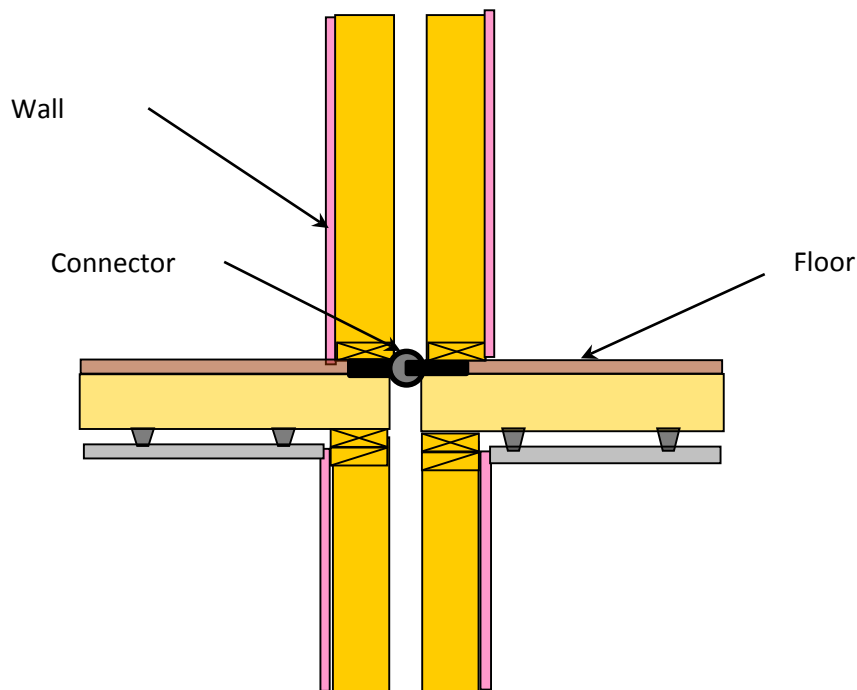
Cross section of inter-tenancy double-stud wall showing potential structural connector location to transfer loads across the floor diaphragm.
